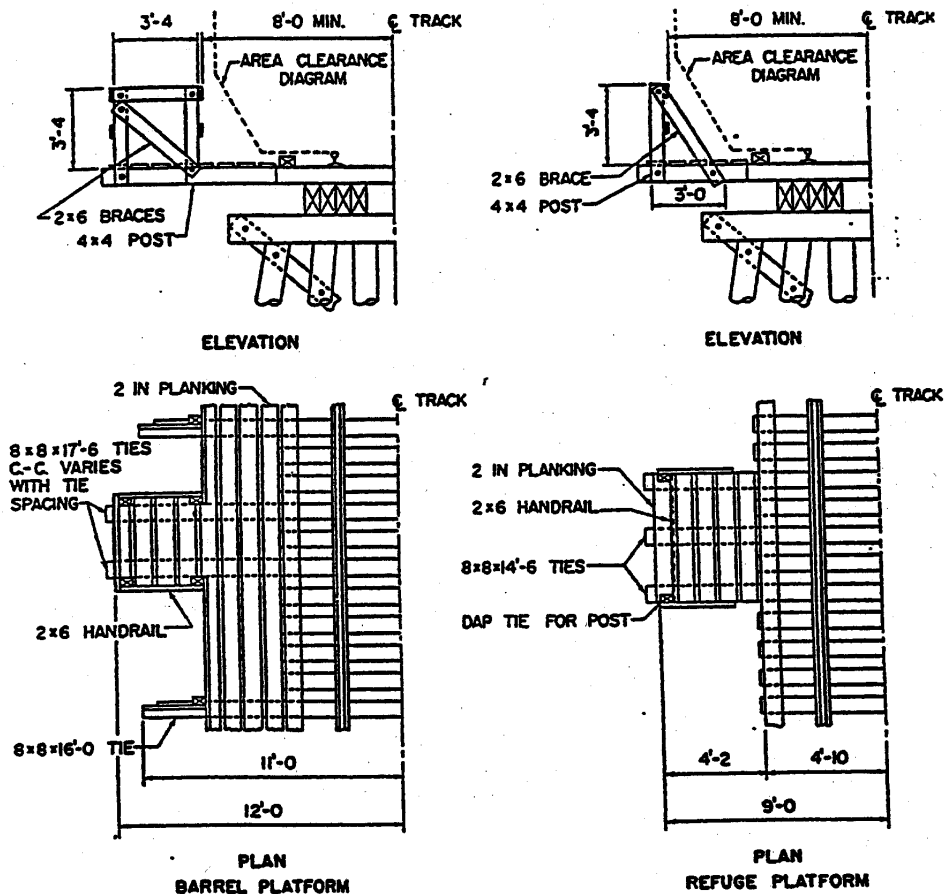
Walk and Handrail—Open-Deck Trestles—To Be Used Where Required
